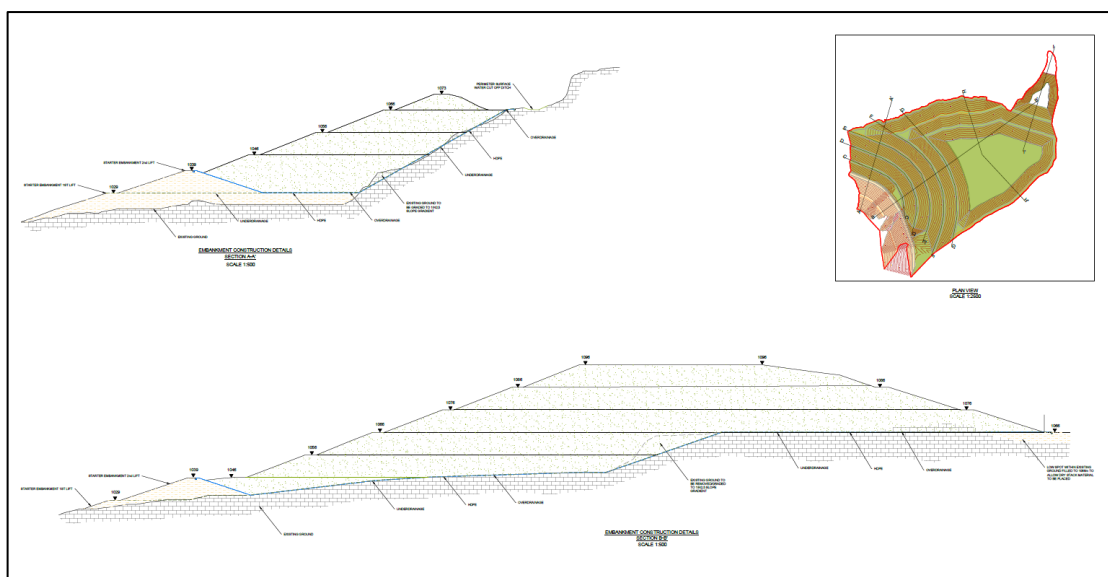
Veovaca TSF design plan and cross sections - Sourced from Wardell Armstrong 'Vares Silver Project TSF Design 5.1 Mt – Relocation' report (November 2024)
